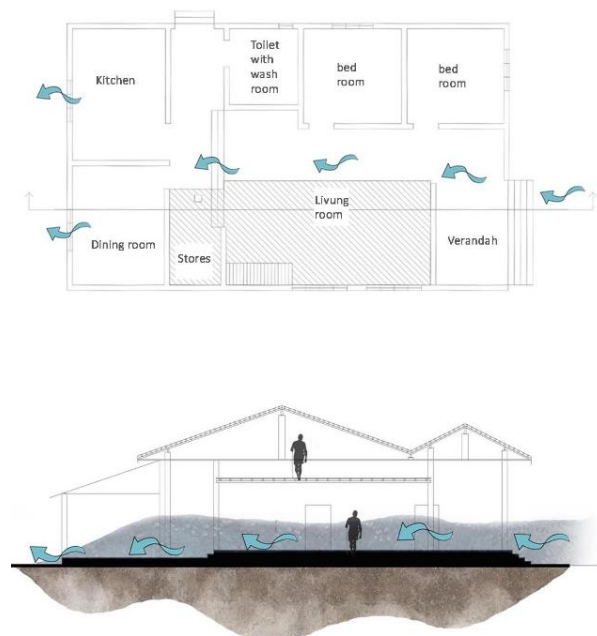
Floor Plan and Cross Section showing movement of flood water and level of inundation in Case 2 (Source: Henarangoda, 2020)
